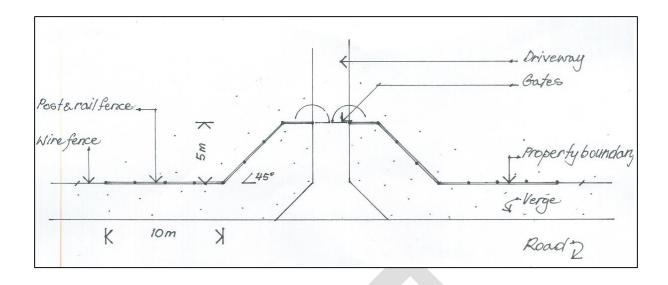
Example of layout of fencing and driveway gate inset
